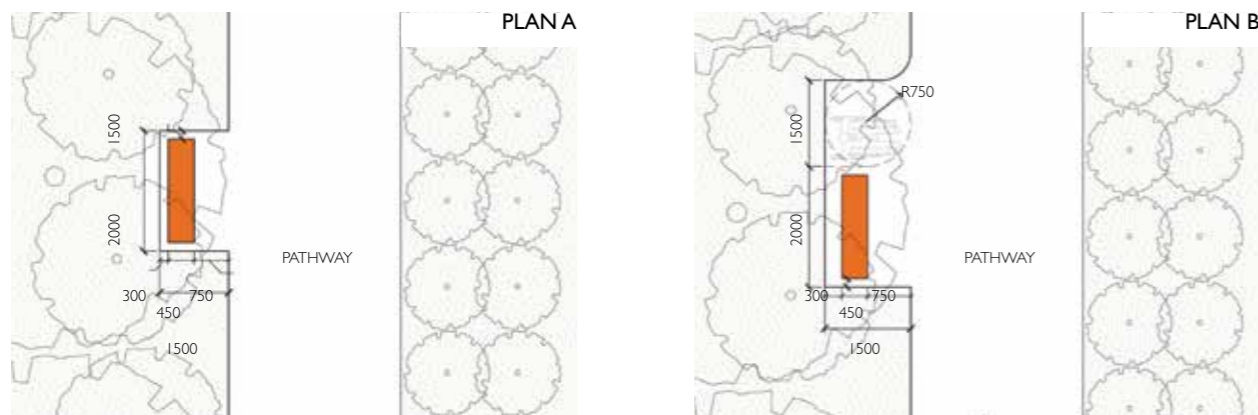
Typical plans showing bench offset area with/without space for wheelchair along pathway.
